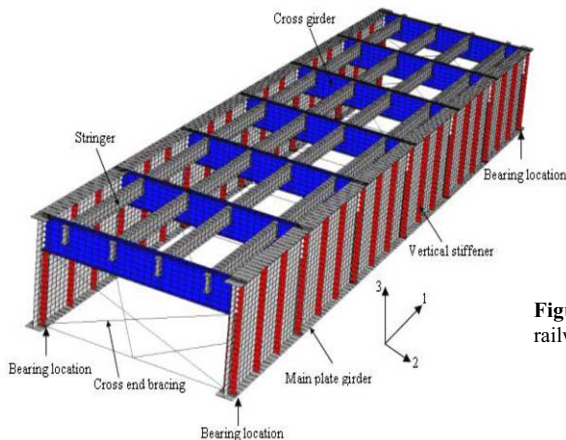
General layout of the full-scale plate girder of a double track open-timber railway steel bridge.
